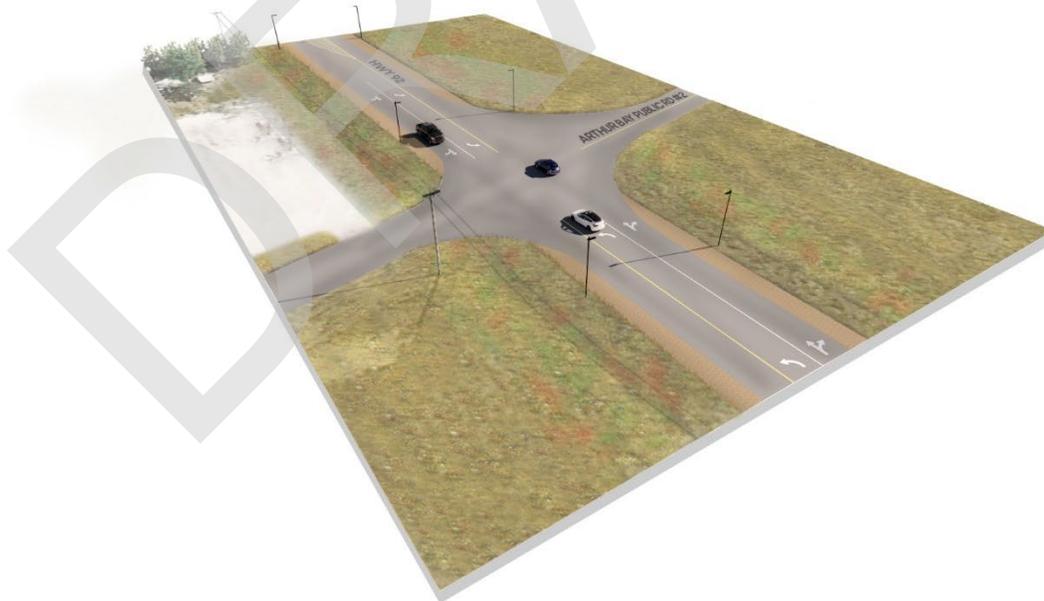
Lake McConaughy Road Improvement – Typical Intersection Improvements
